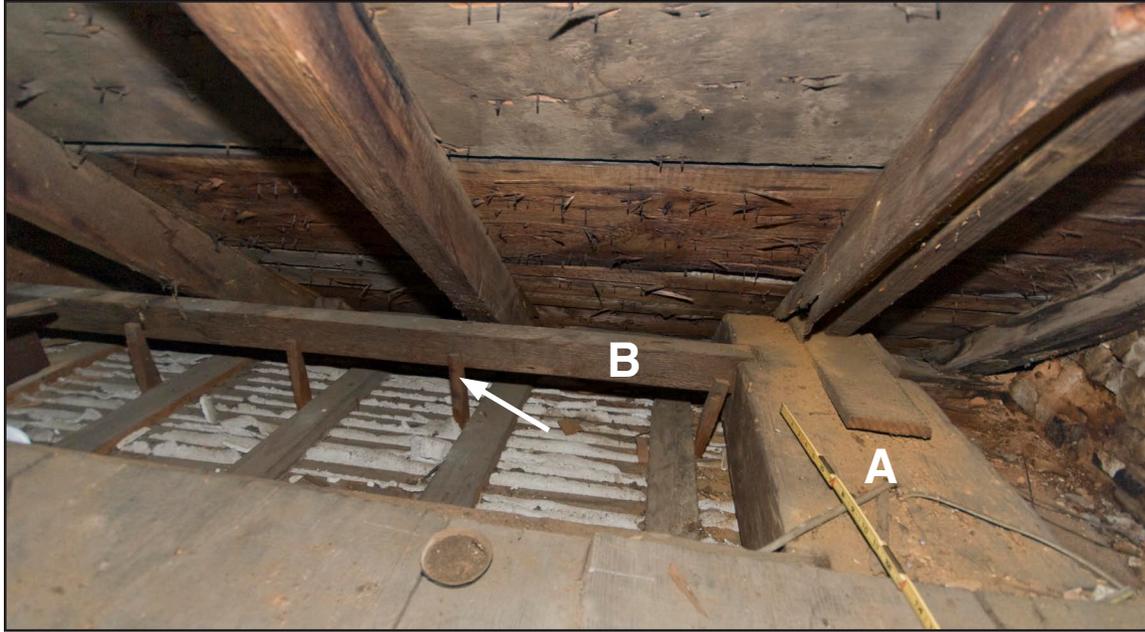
Rear of attic at parlor center tie beam (i.e., summer tie beam) marked "A" showing insect damage to rafter that sits on the beam, and a typical original joist (B) with wood hangers (arrow) added in the 1840s to carry the current c. 1840s parlor chamber ceiling. The floor framing appears to have originally been fully exposed and unpainted as the ceiling for the original parlor chamber.
